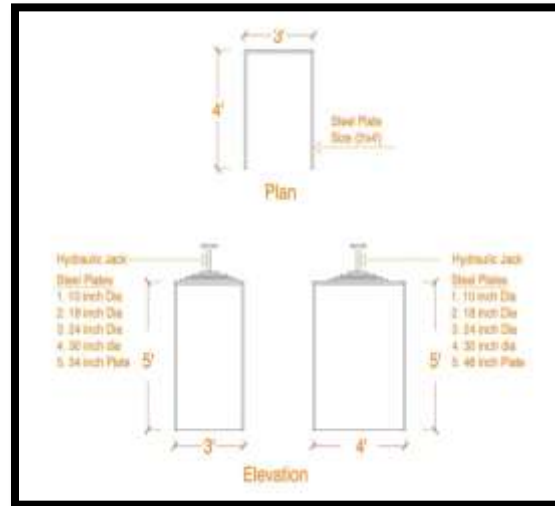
AutoCAD Drawings of the Large Scale Test Model
